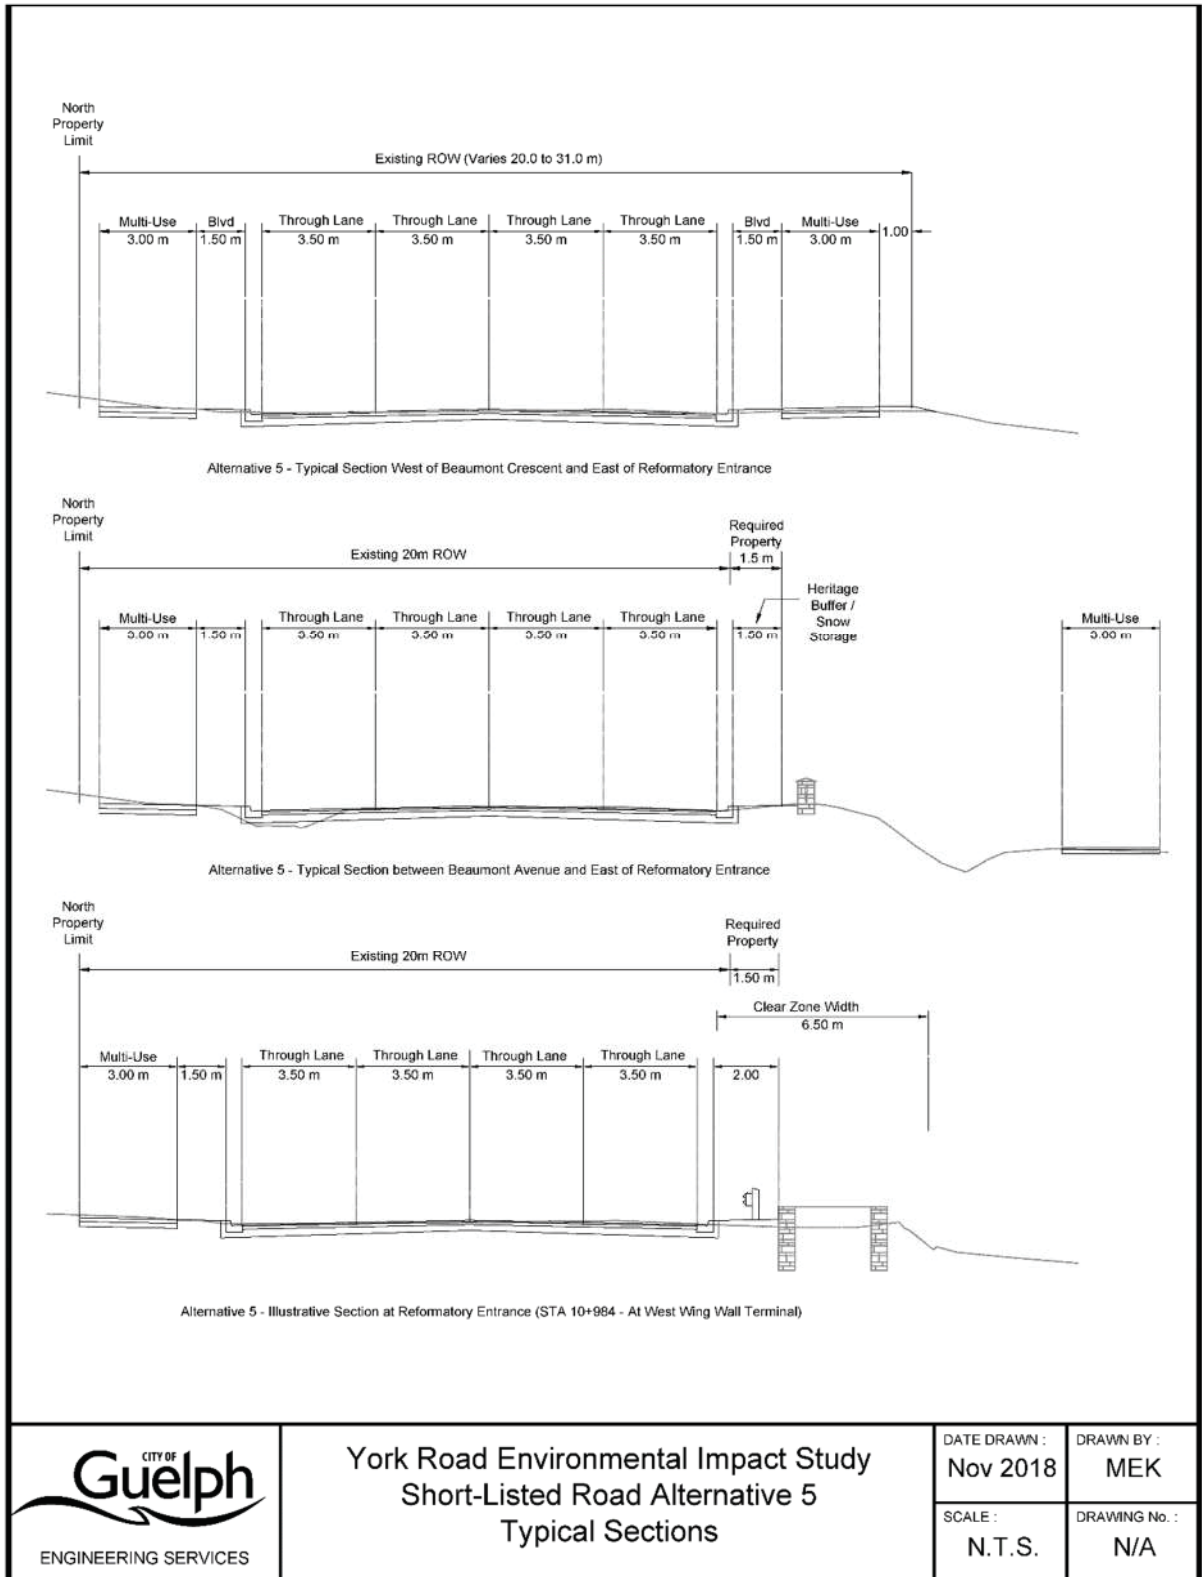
Alternative 5 - Typical Section Adjacent to York District Lands
